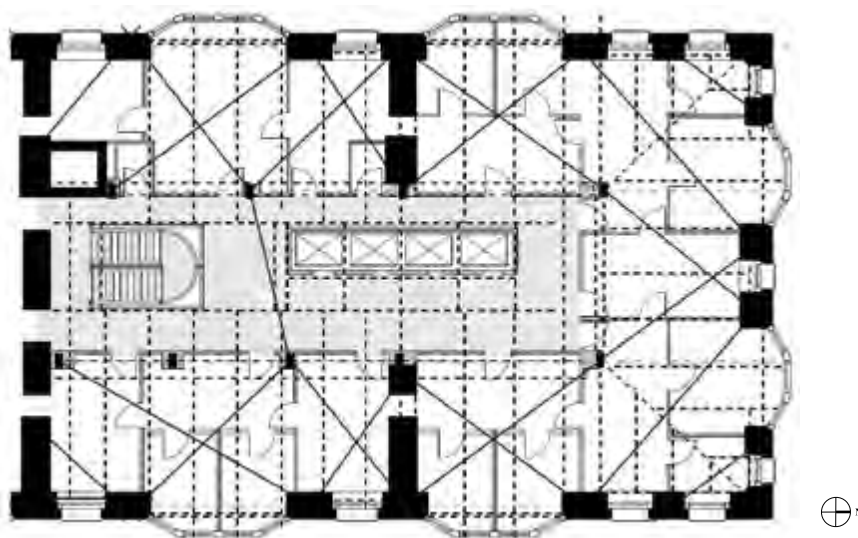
This ground floor plan of the Monadnock Building (Chicago, 1893) highlights a turning point in tall building history when thick masonry walls were replaced with steel frame skeletons, giving rise to taller buildings and the need for elevators. Source: Thomas Leslie, redrawn by Mattia Mercanzin
